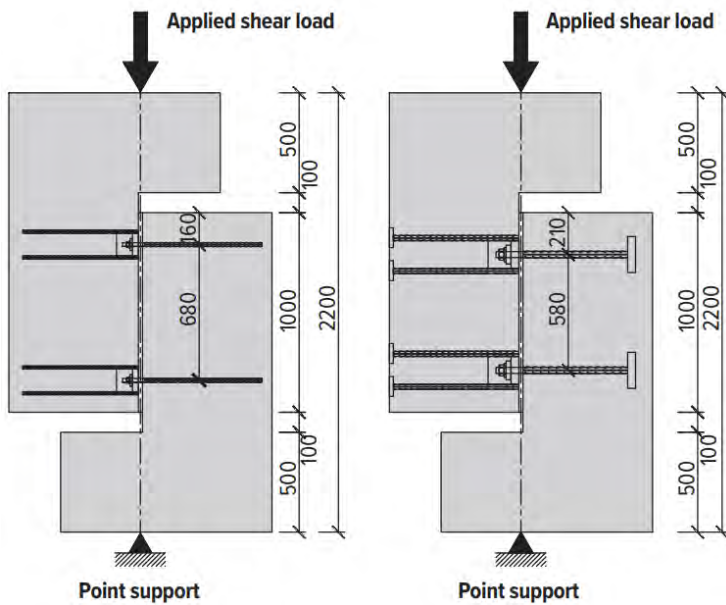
"Wet" connection detail with bolted steel assembly detail shear tests [35]
